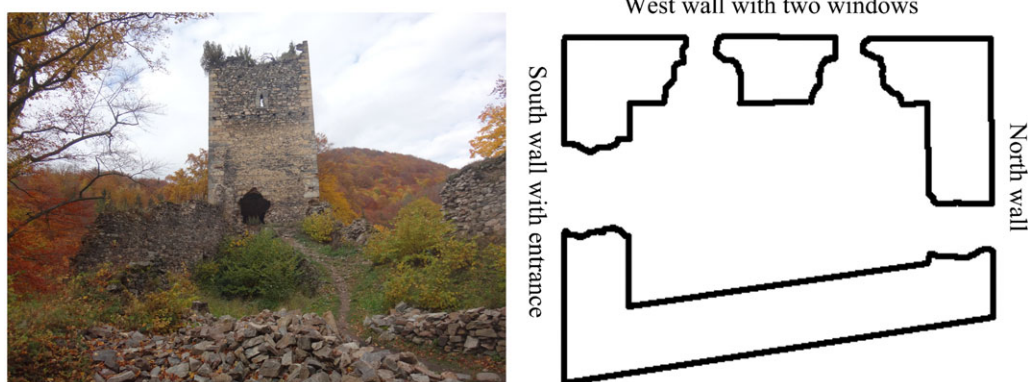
North tower of Rýzmburk castle: a photograph of the steep rocky access path and the entrance (left, taken in 2021) and a ground floor plan according to Lehký (2012) (right).
